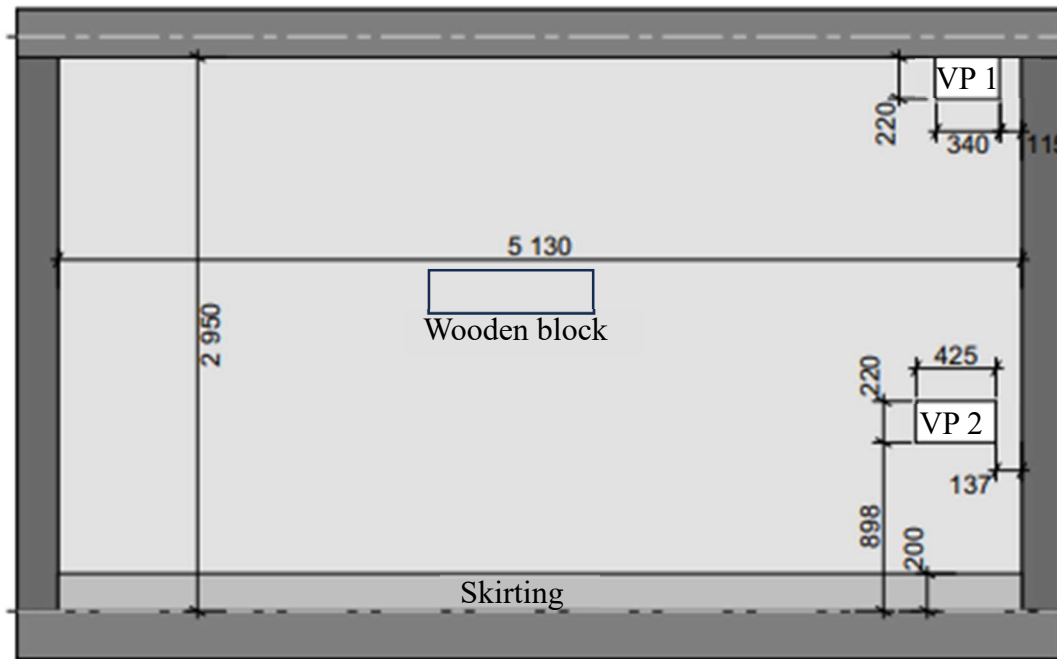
South wall elevation, Archicad. Scale 1:50. Elevation by Keaghan De La Mer.
